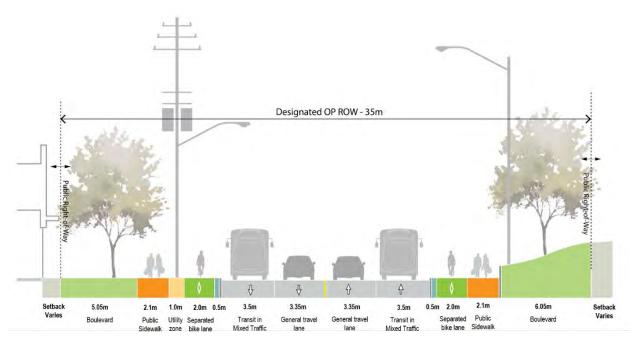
Preferred ROW Alternative (Segment 2D: Meadow Wood Road to Johnson's Lane)
